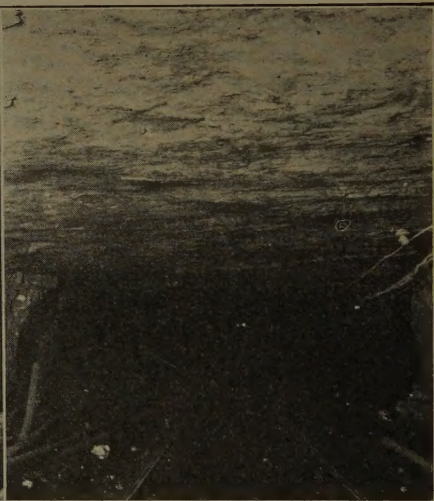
SHALE ROOF IN AN ENTRY THAT HAS ALWAYS BEEN VENTILATED WITH COOLED AIR.
